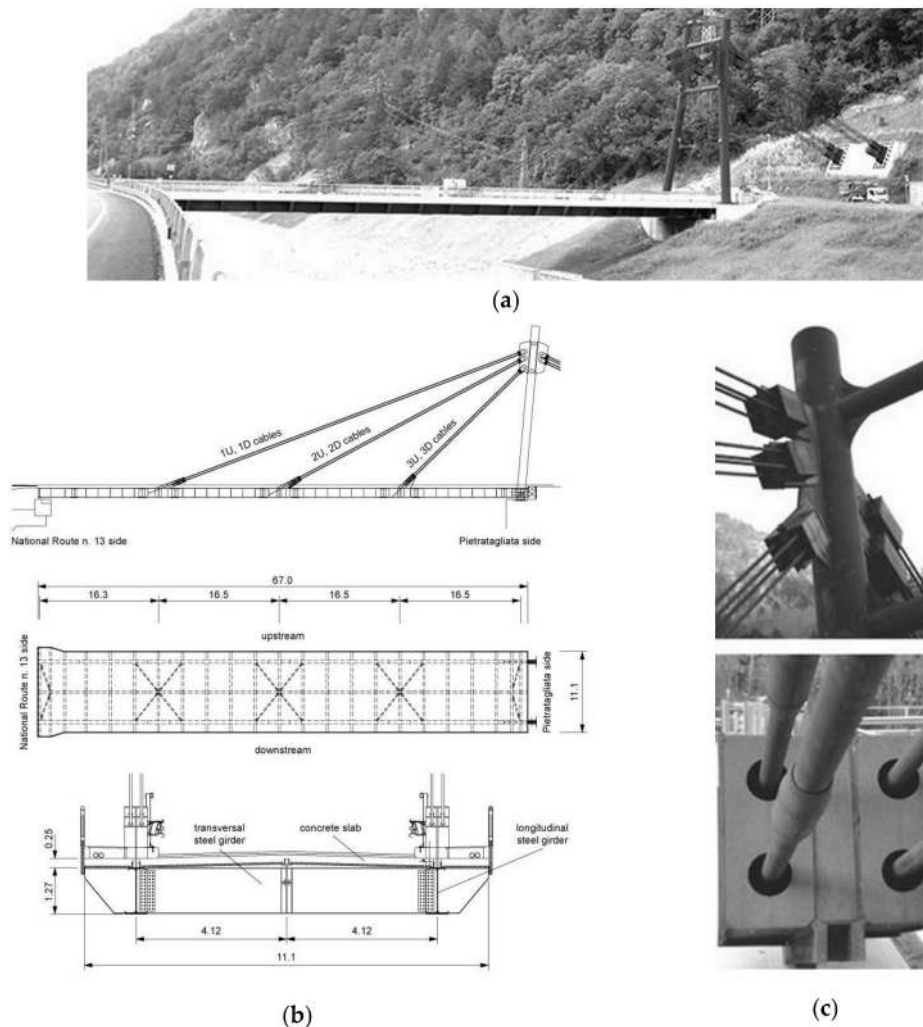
Pietratagliata Bridge (Italy): (a) general view; (b) technical drawings with lateral view, plan, and transversal cross-section; (c) stays-to-tower and stays-to-deck connection details (dimensions in meters). Figures reproduced from [44] with permission from Springer Nature, Copyright © license agreement no. 4386400703508 (July 2018).
